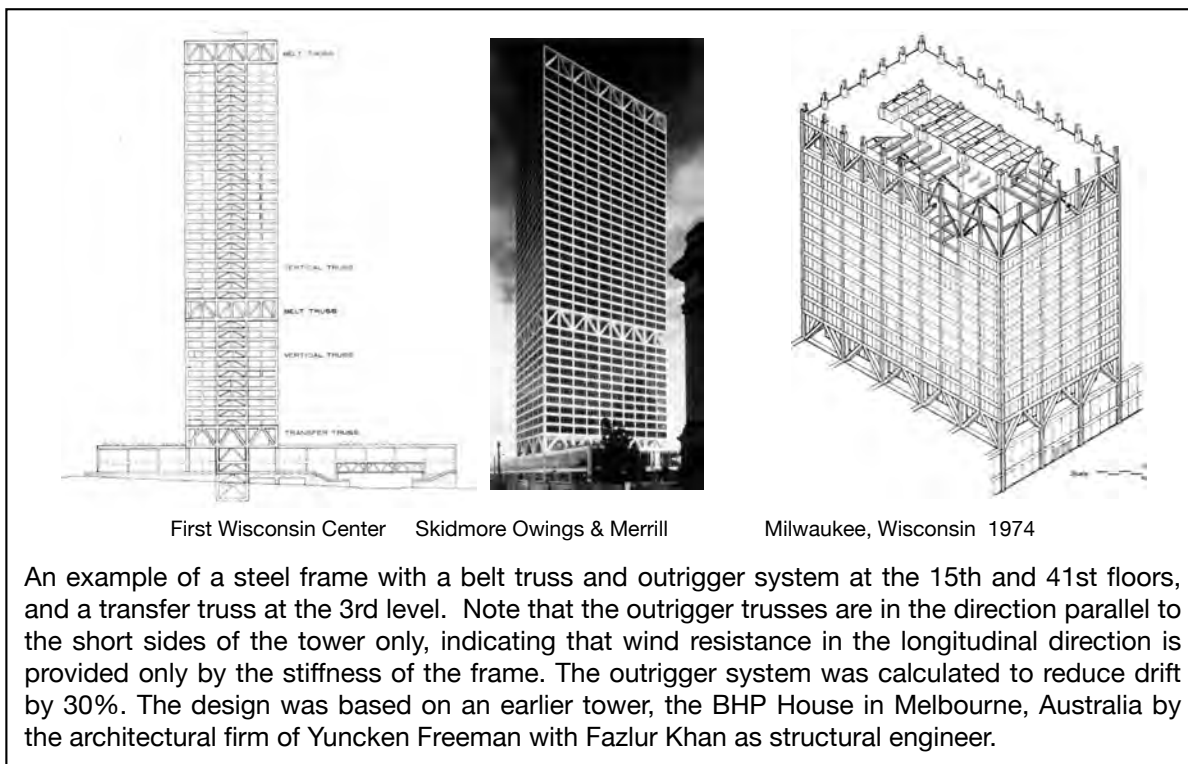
Outrigger and Belt Truss Structure. Example.
